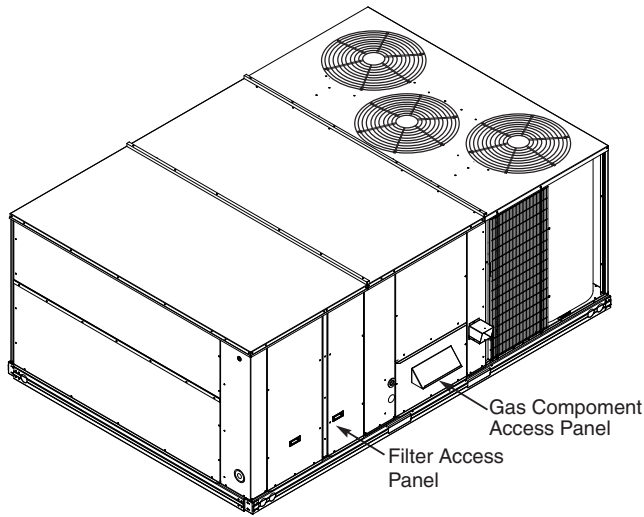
Gas Component Access and Filter Access Panels – 15 to 27-1/2 Ton Units
